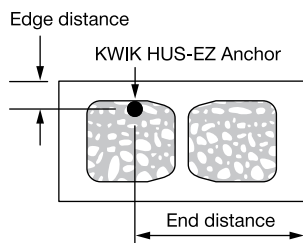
Edge and end distances for the KWIK HUS-EZ anchor installed in the top of CMU masonry wall construction
